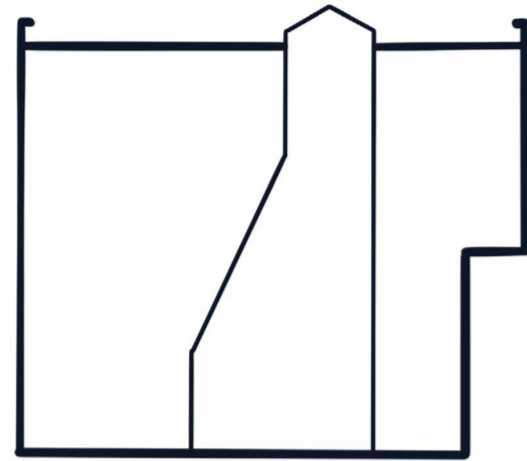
SketchUp diagrams of construction modification on dry stone wall
